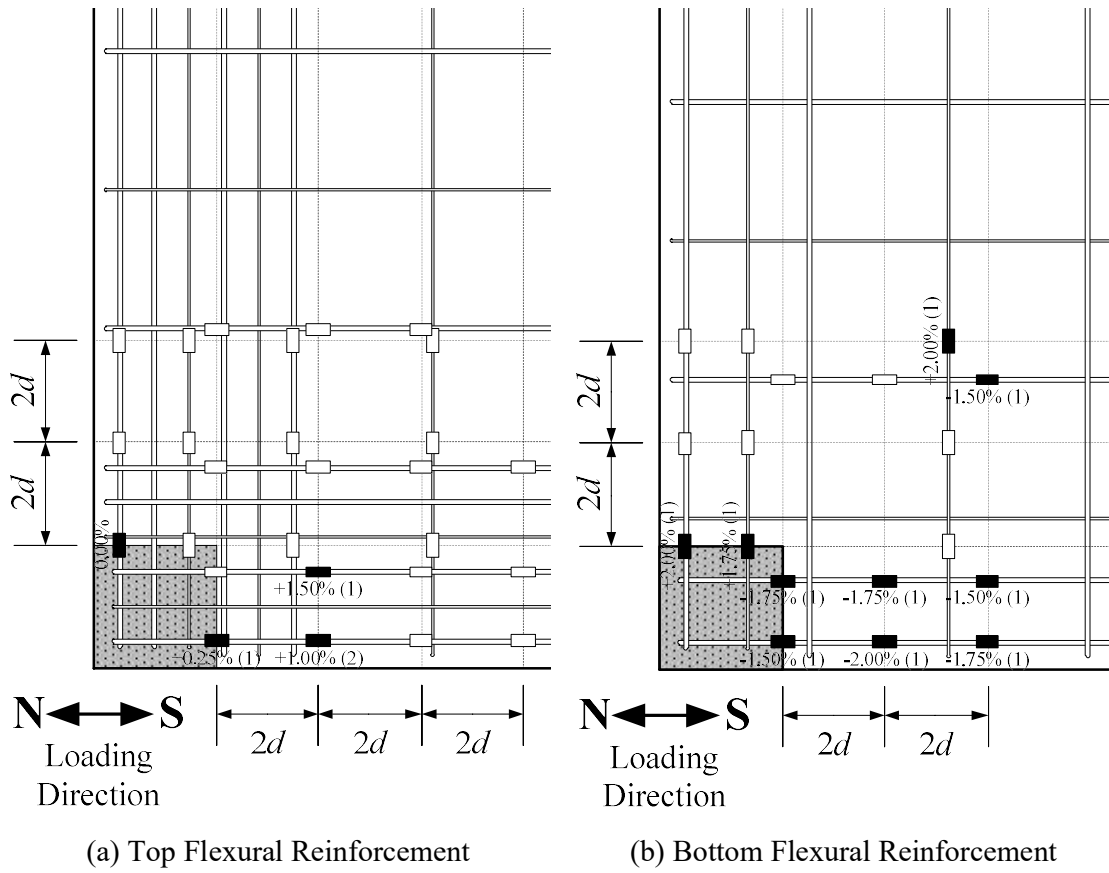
Extent of Yielding of the Slab Flexural Reinforcement of Specimen R1
